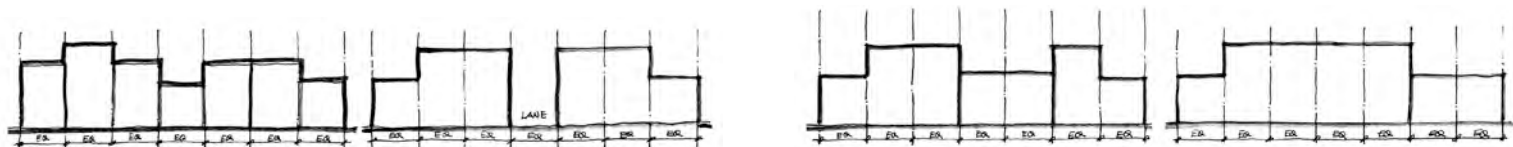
Historical Downtown - Elevation - Building and Block Face Rhythm Examples
